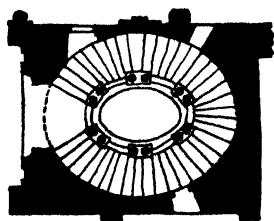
PLAN OF THE OVAL STAIRCASE,
